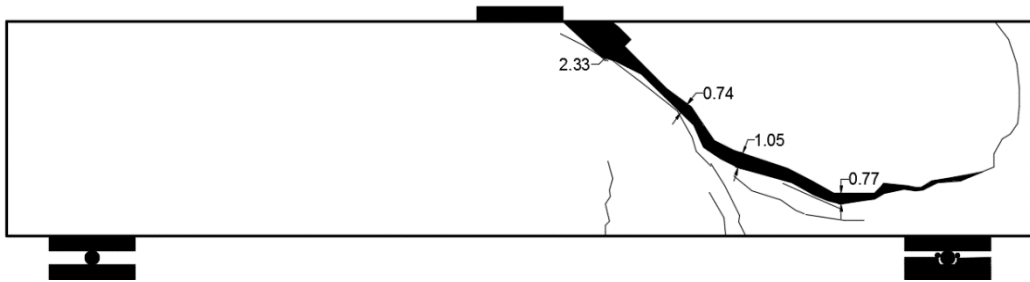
Crack pattern at failure for SNFRC 0.5% beam #13
